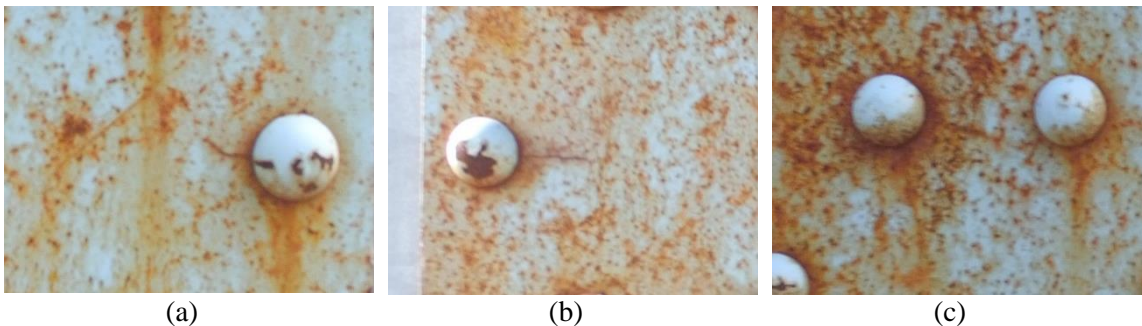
Riveted plate inspection images: (a) true positive (hit), (b) false negative (miss), and (c) false positive
